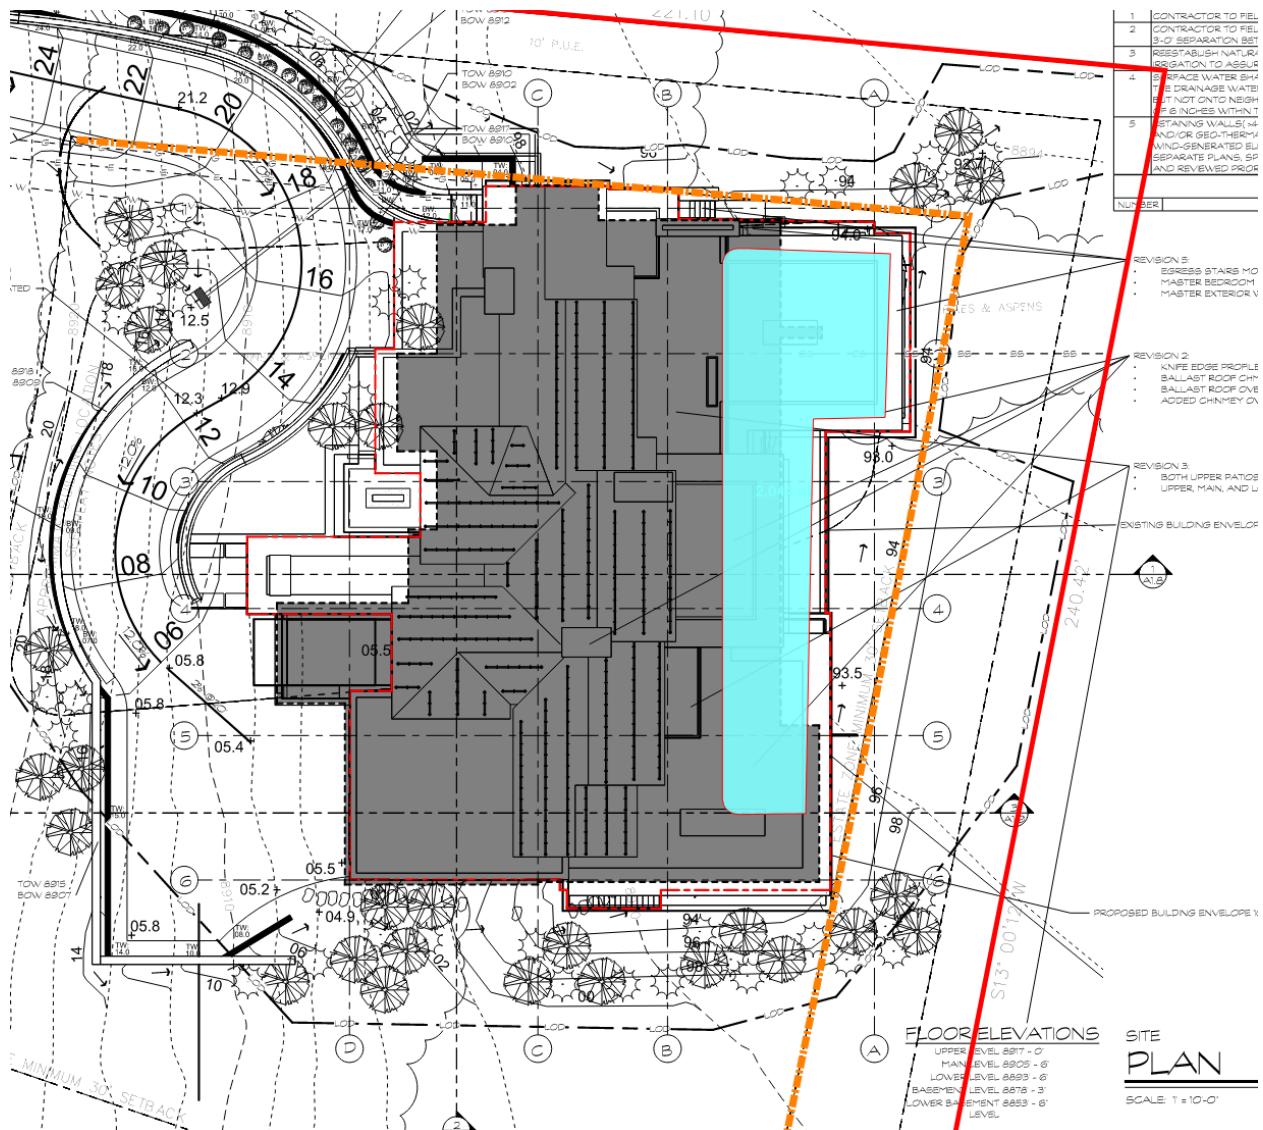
Applicant's Site Plan. Proposed Pool in Blue, 30-Foot Setback in Orange, and Property Lines Shown in Red.
